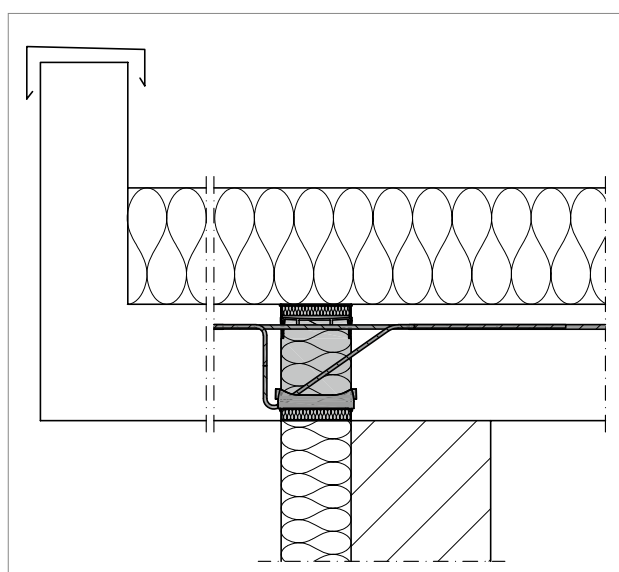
Schöck Isokorb® XT type K: Connection to a canopy
